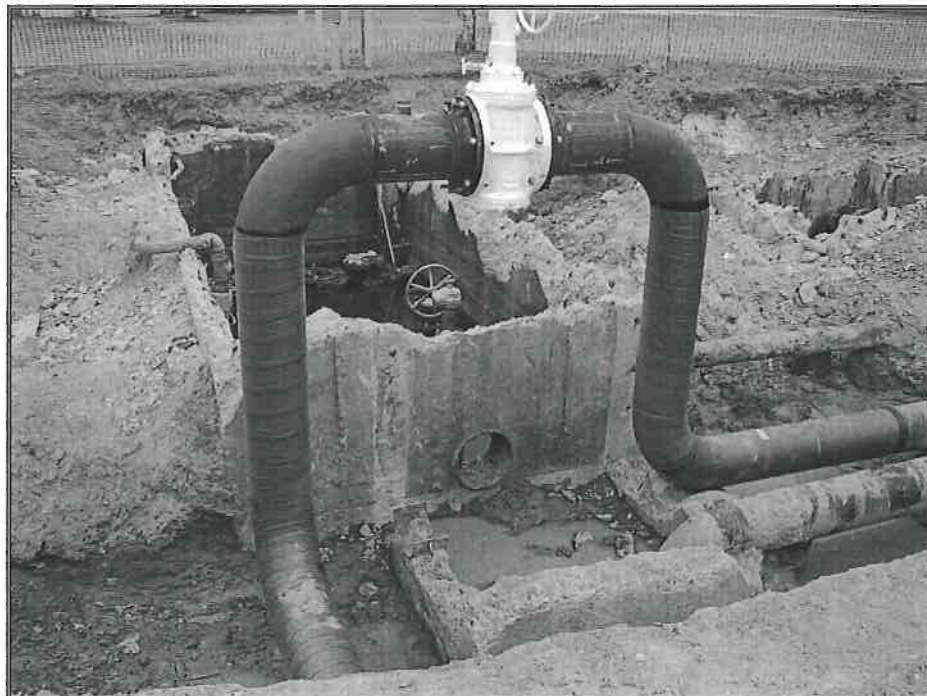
B – VP 24 Valve Setting Installation JP-5 Pipeline to Pier 3
